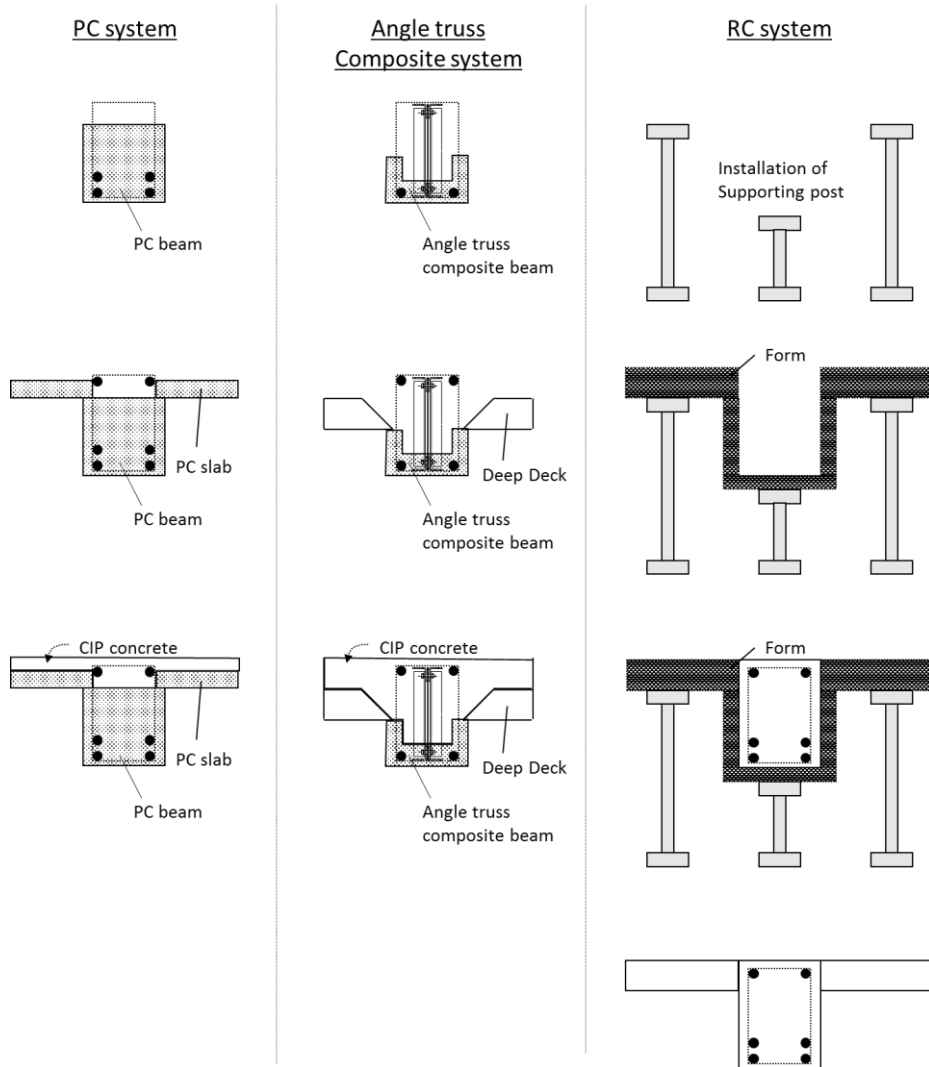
Comparison of angle truss composite beam with precast concrete and conventional reinforced concrete structure
